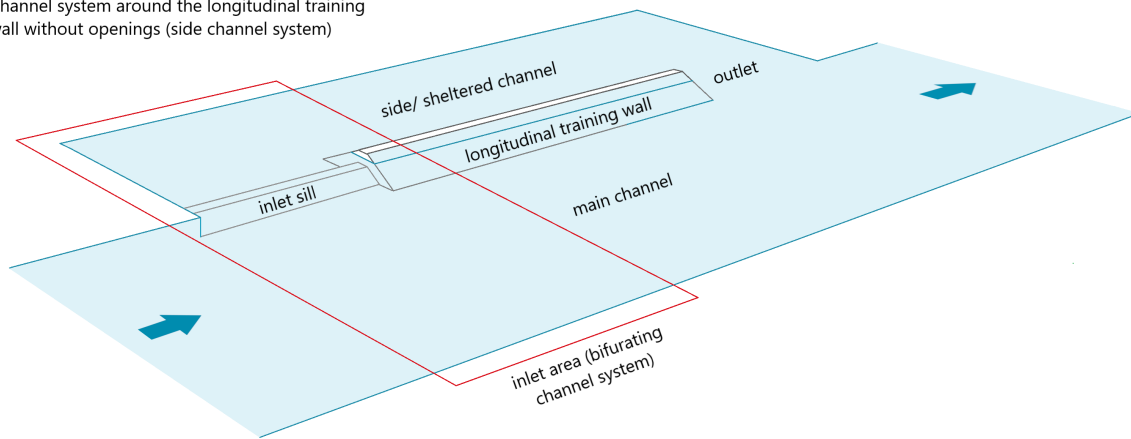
Sketch of the channel system around a longitudinal training wall with inlet sill and without openings where the studied inlet area is indicated
